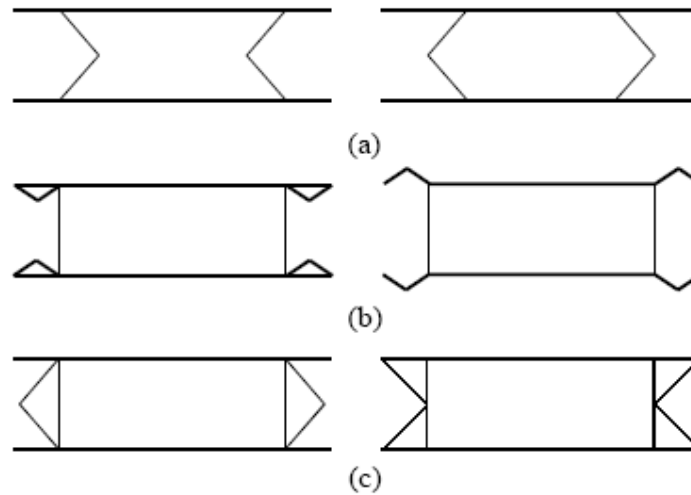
Examples of (a) modified shape of vertical faces of bearing (b) modified shape of surrounding contact surface and (c) preformed shapes fastened to vertical faces of bearing.
